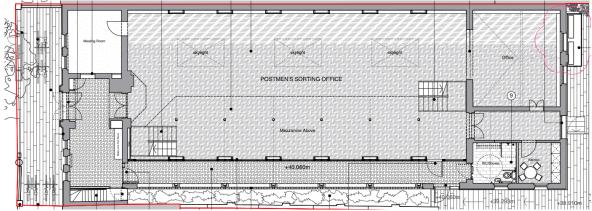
Proposed Office Plan (Ground Floor) from permitted scheme 2016/6361/L
